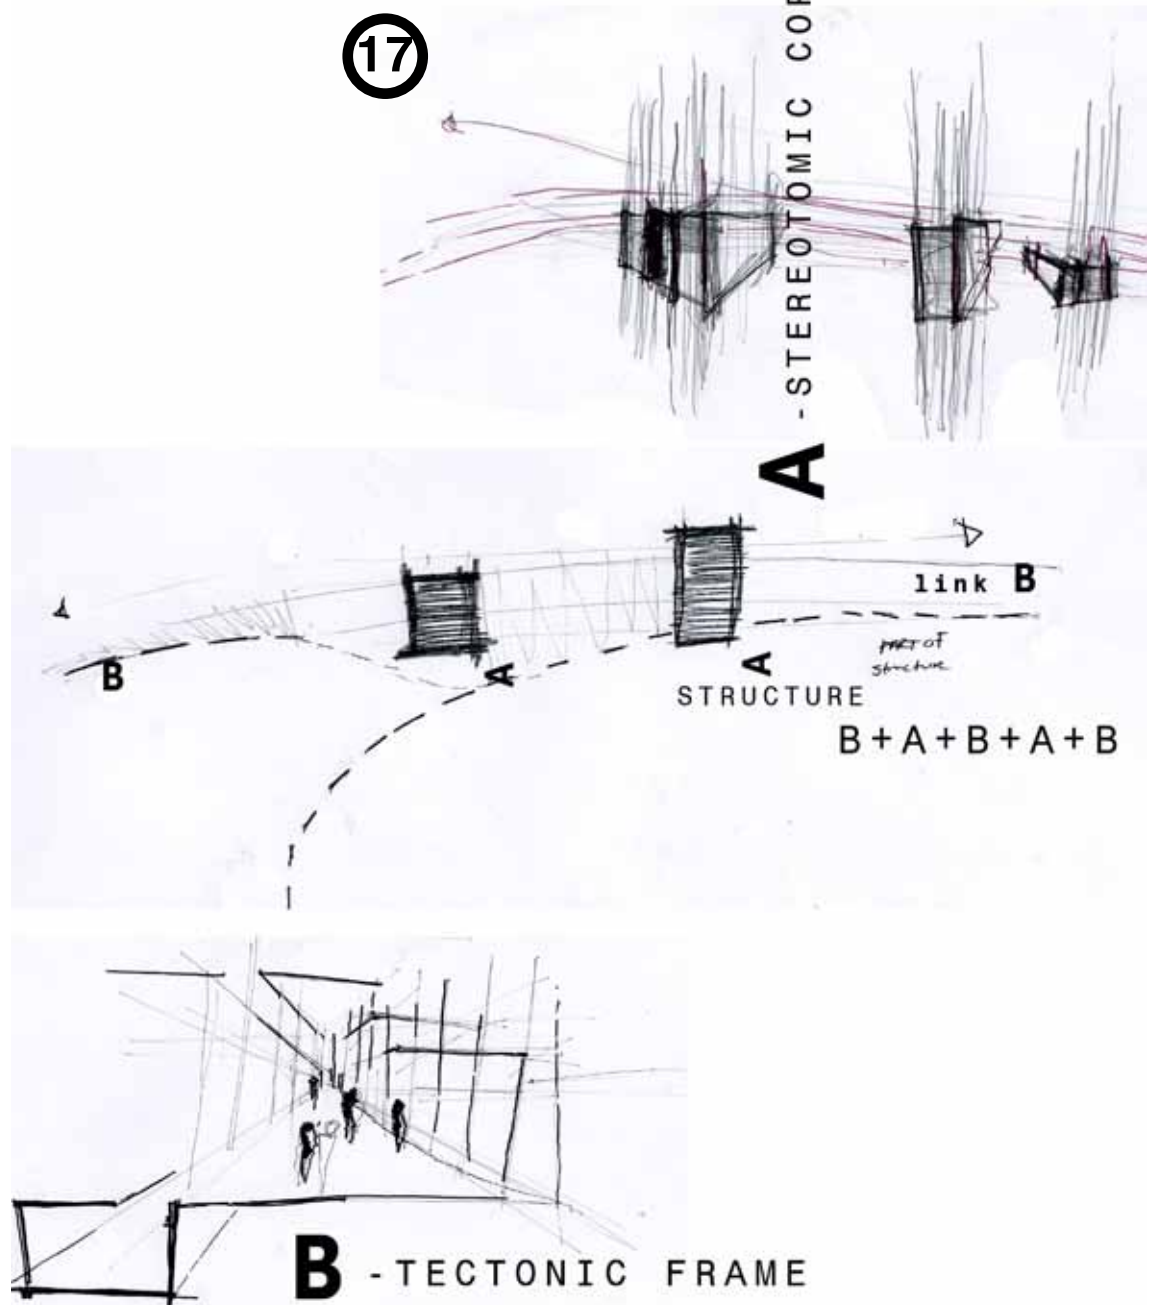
Design development 17: Structural system & tectonic approach. [Source: Author]
